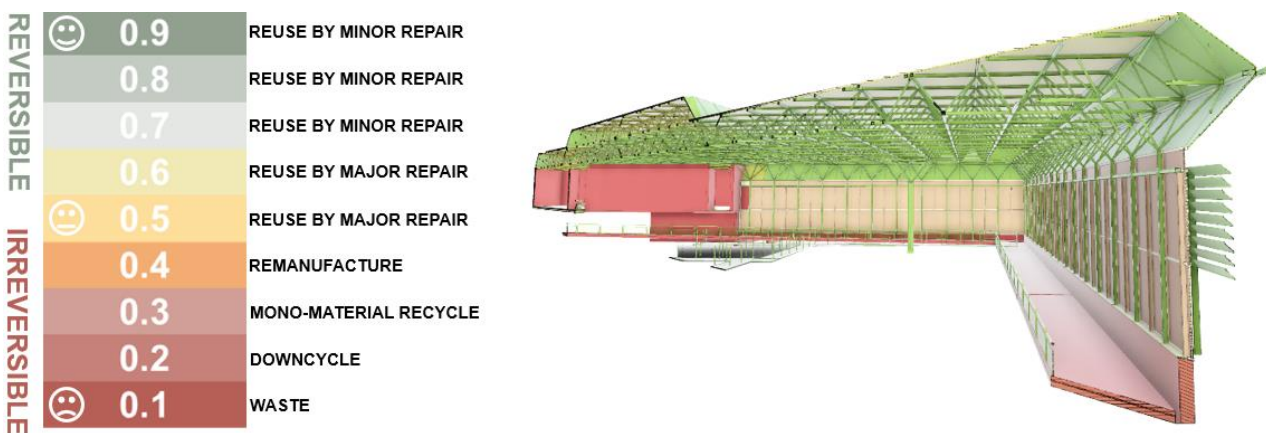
Application of RBIM on an existing building (Adapted from Bergstra, 2023; Cilliers, 2023)
